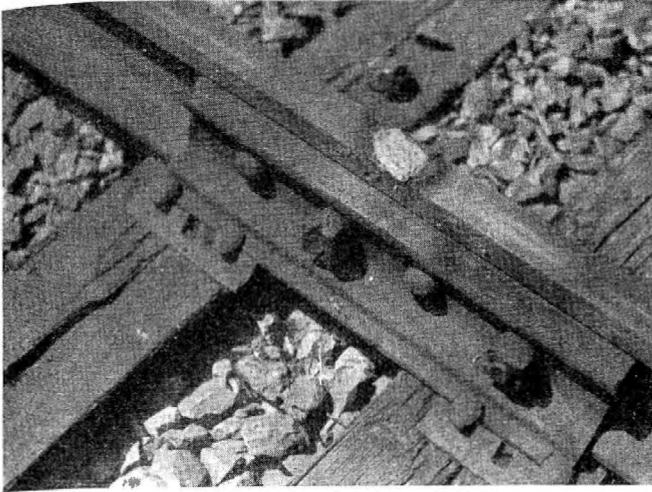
The rail end batter welded in readiness for grinding operations. Note bond holes
